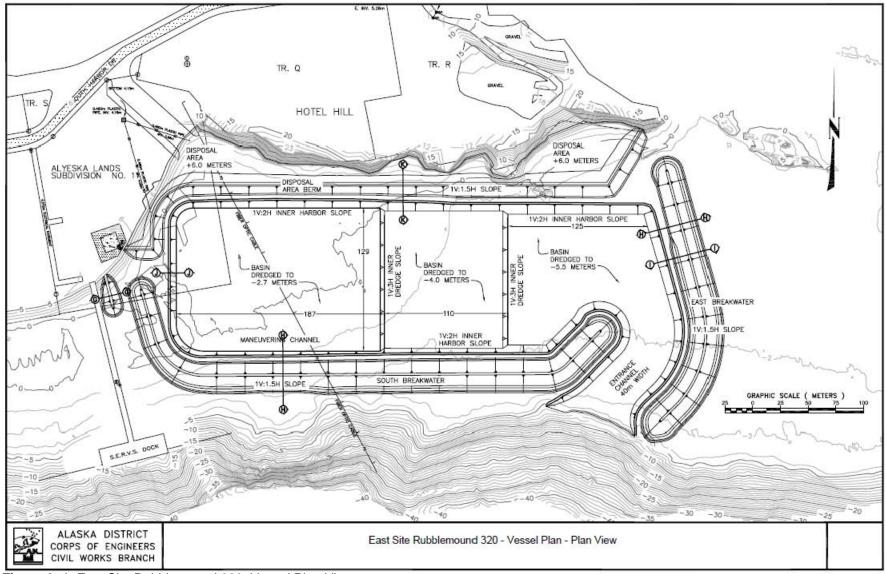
East Site Rubblemound 320-Vessel Plan View
